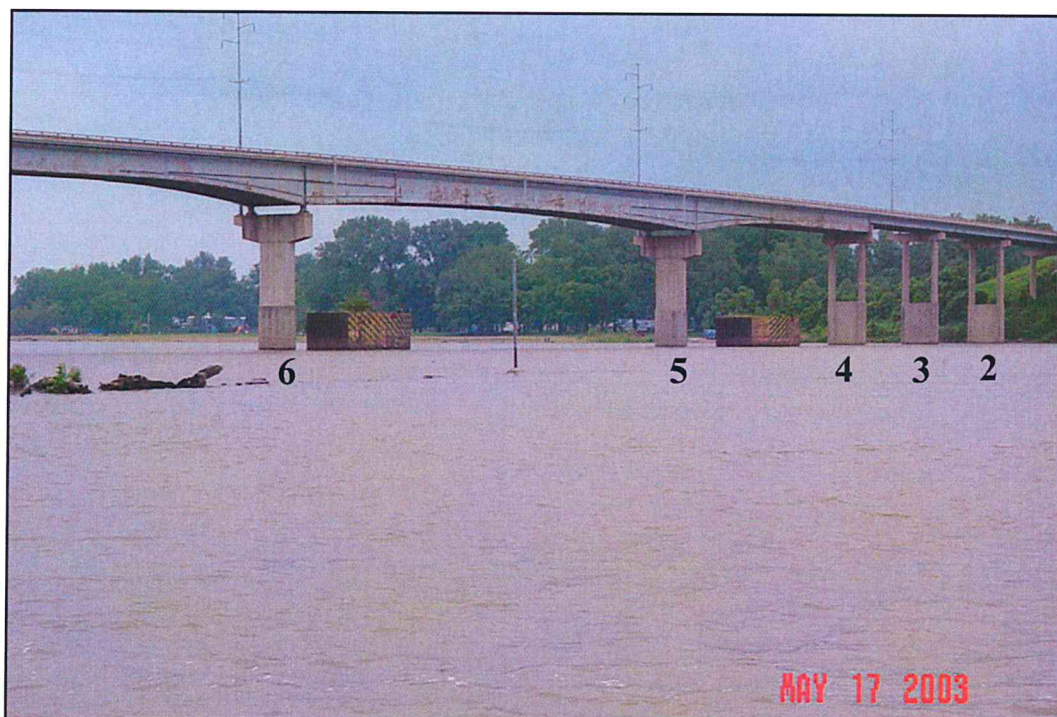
Upstream side of channel span and pier protection at Pier 6 and Pier 5.
